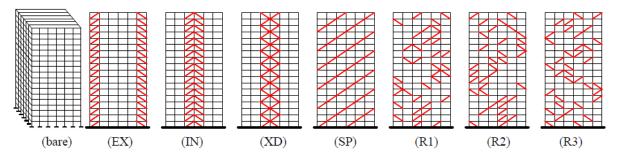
Tested Bracing Arrangements of the Perimeter Concrete Frame (Mezzi 2010)
